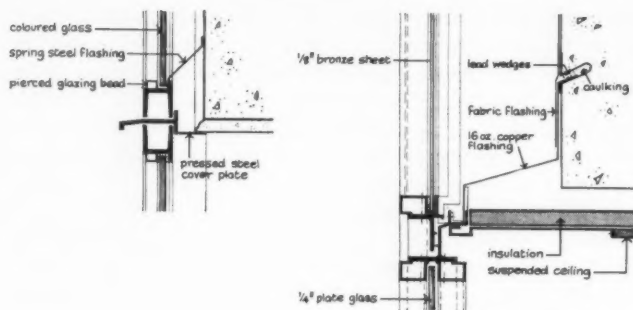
Condensation flashings. Left, at offices in Chiswell Street, London (architects, Handisye and Taylor). Right, on the Seagram Building, New York (architects, Mies van der Rohe and Philip Johnson).
